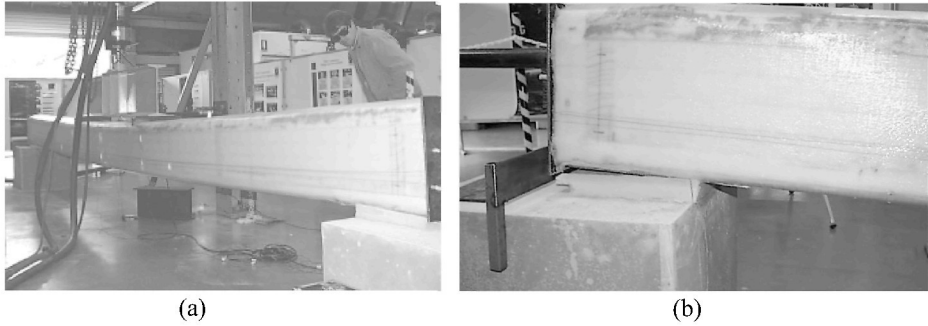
(a) 6m test beam (note holes in the side) (b) End bearing prior to beam failure
